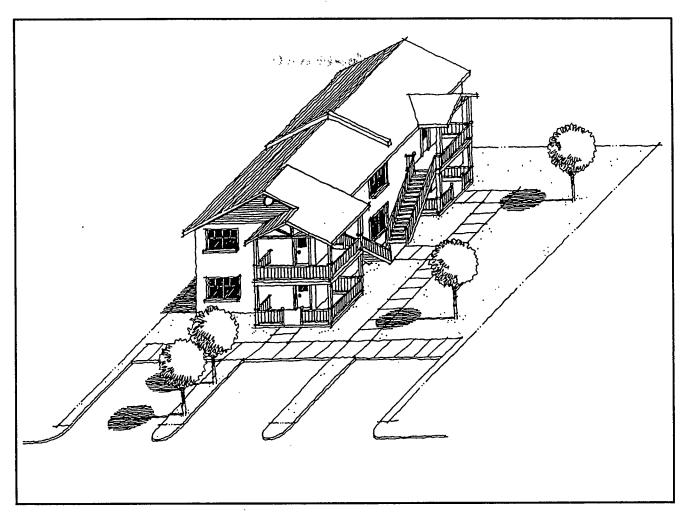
Infill Housing Type R-4: Walk-up Apartments
